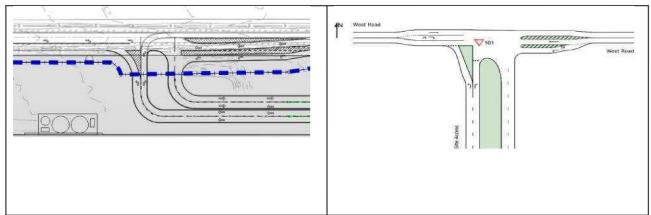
Concept Layout and SIDRA Layout - West Road / Site Access
